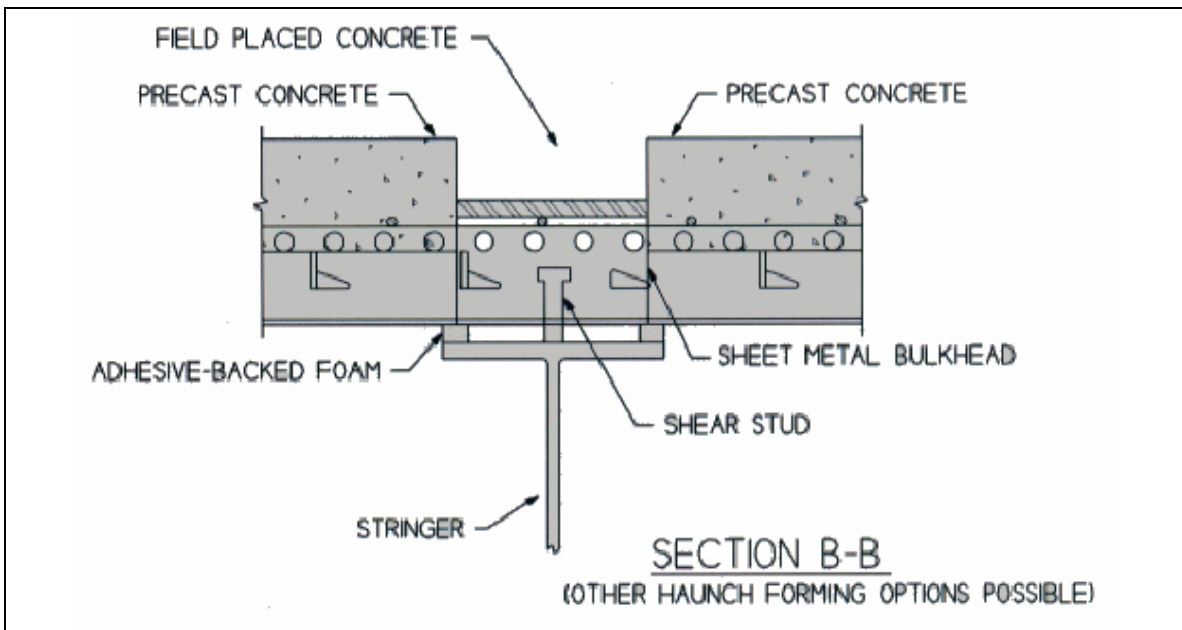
Typical girder/deck connection for precast applications (Exodermic Bridge Deck, Inc., 1998)
